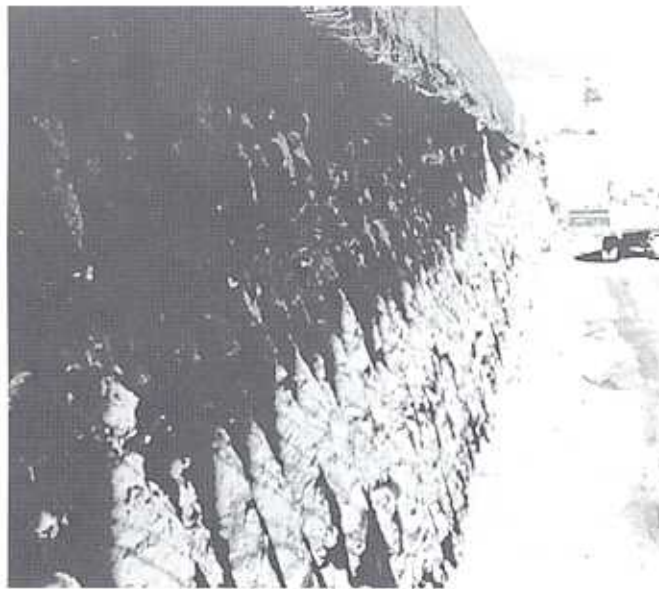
Improved ground by jet-grouting for trench excavation near Naples (Italy)
